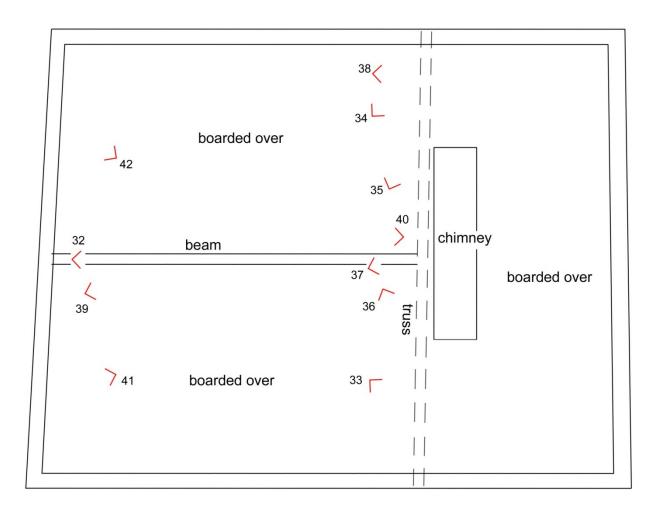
Pipers Cottage: plan of the roof space, showing location of main truss.
